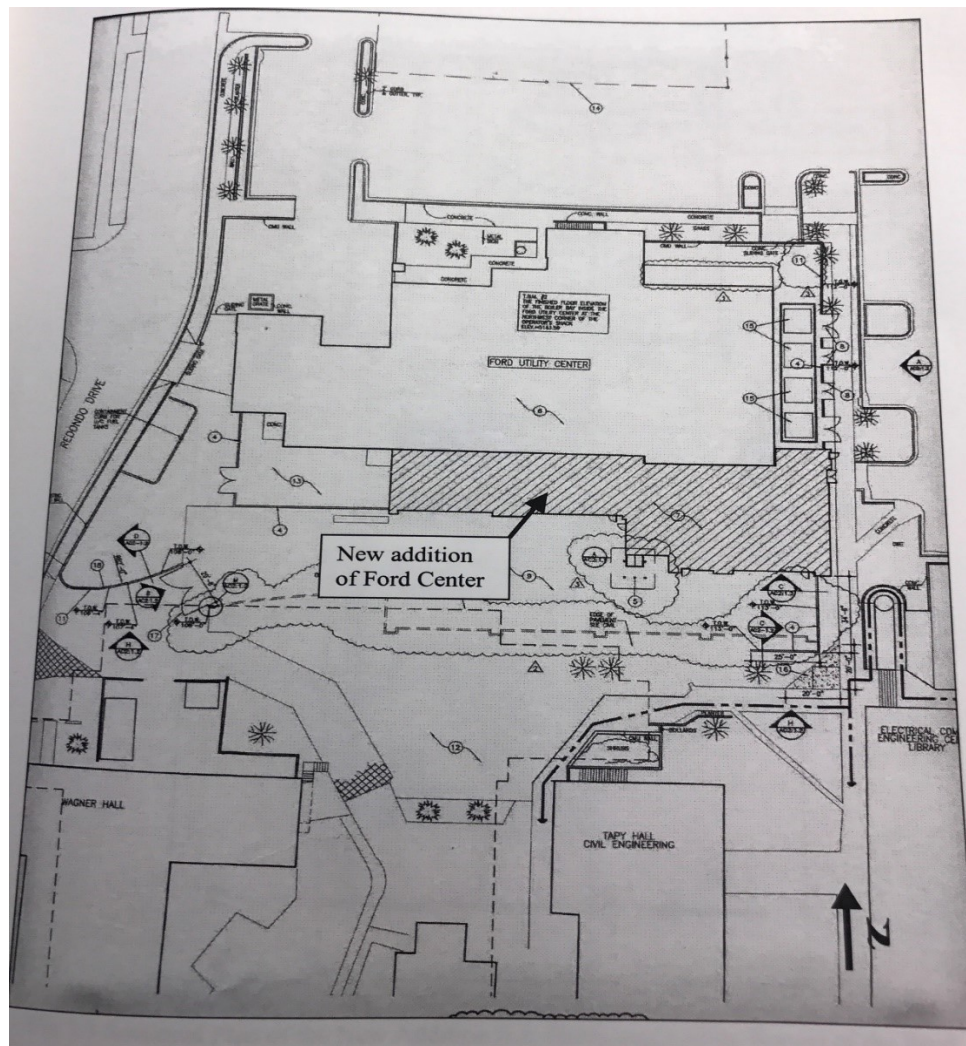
Site plan of Ford Utility Center (Mareddy 2006).
